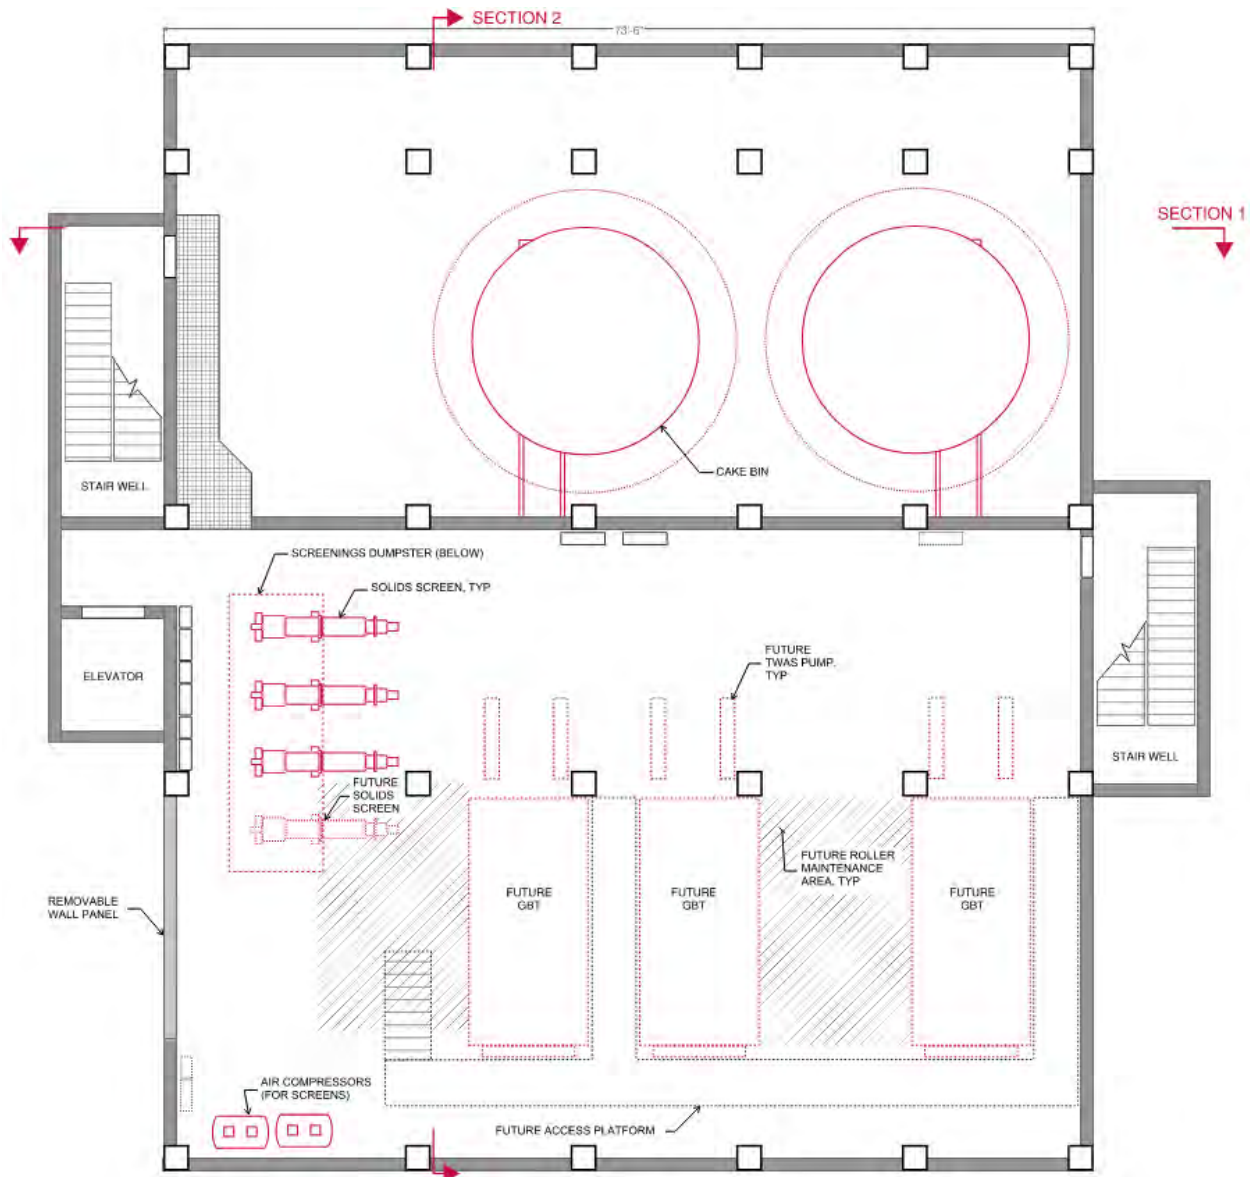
New Thickening/Screening/Dewatering Facility Second-Floor Plan
